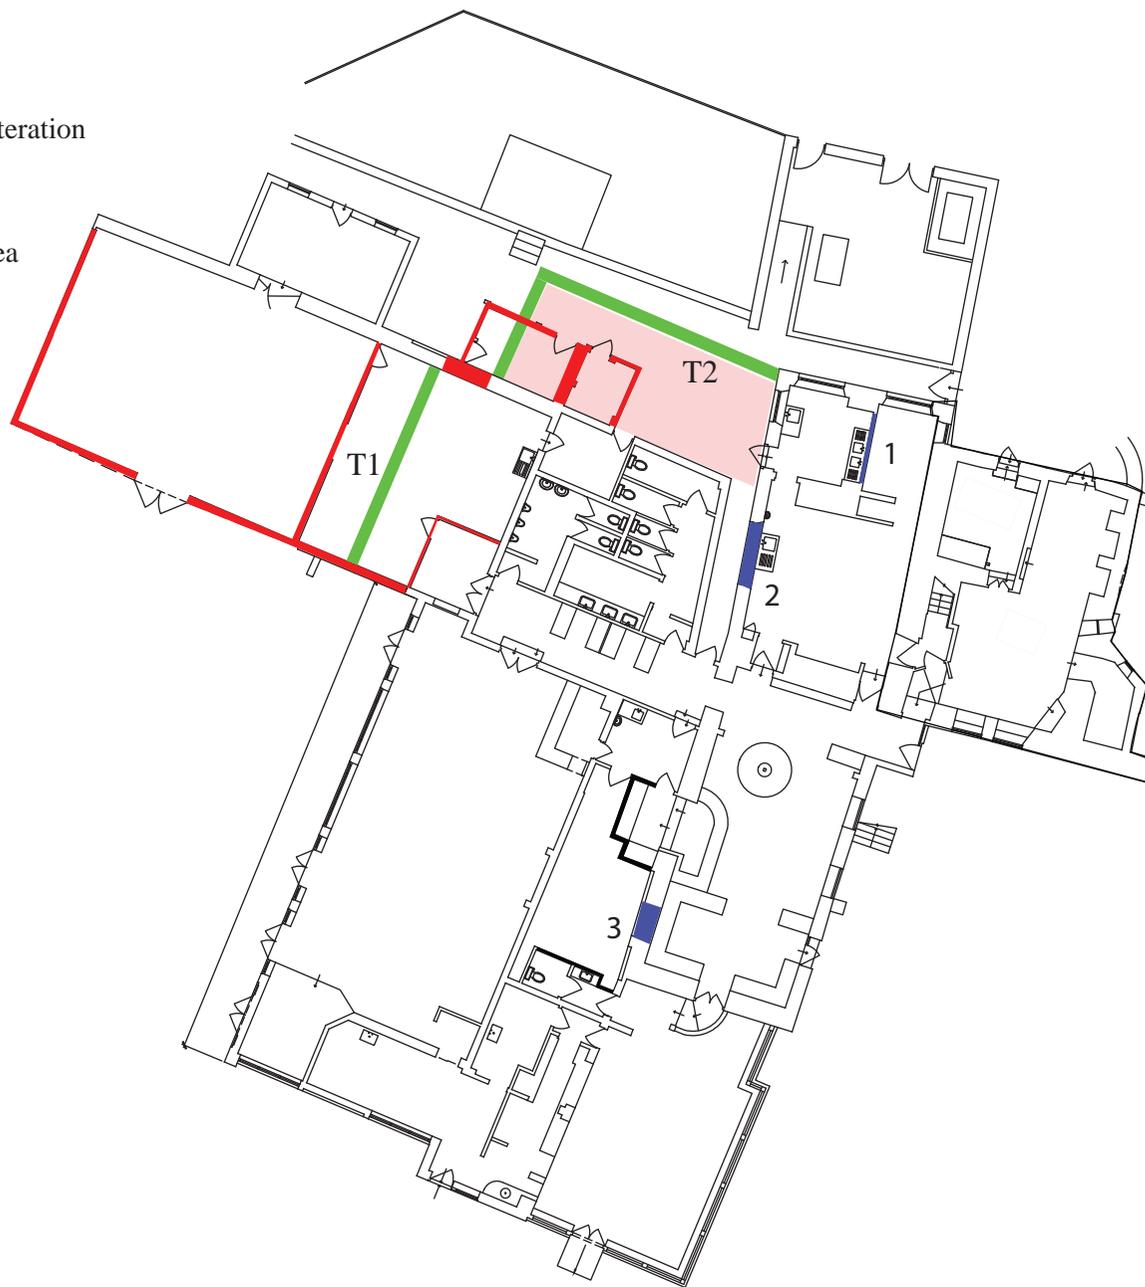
Floor plan of the Anchor Inn, Tintern, (after ADS Design) showing locations of work subject to archaeological watching brief
